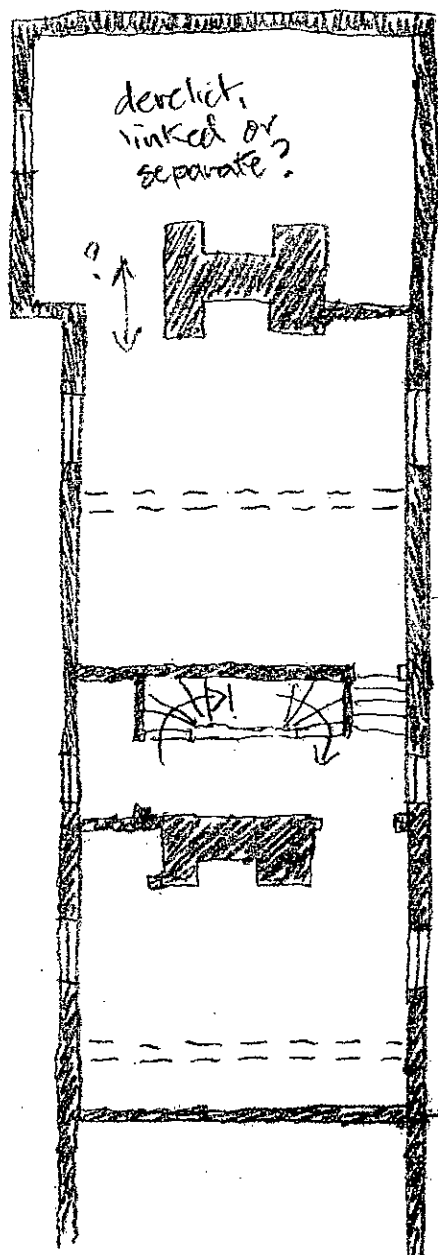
; sketch reconstruction of the eighteenth-century first floor plan.
